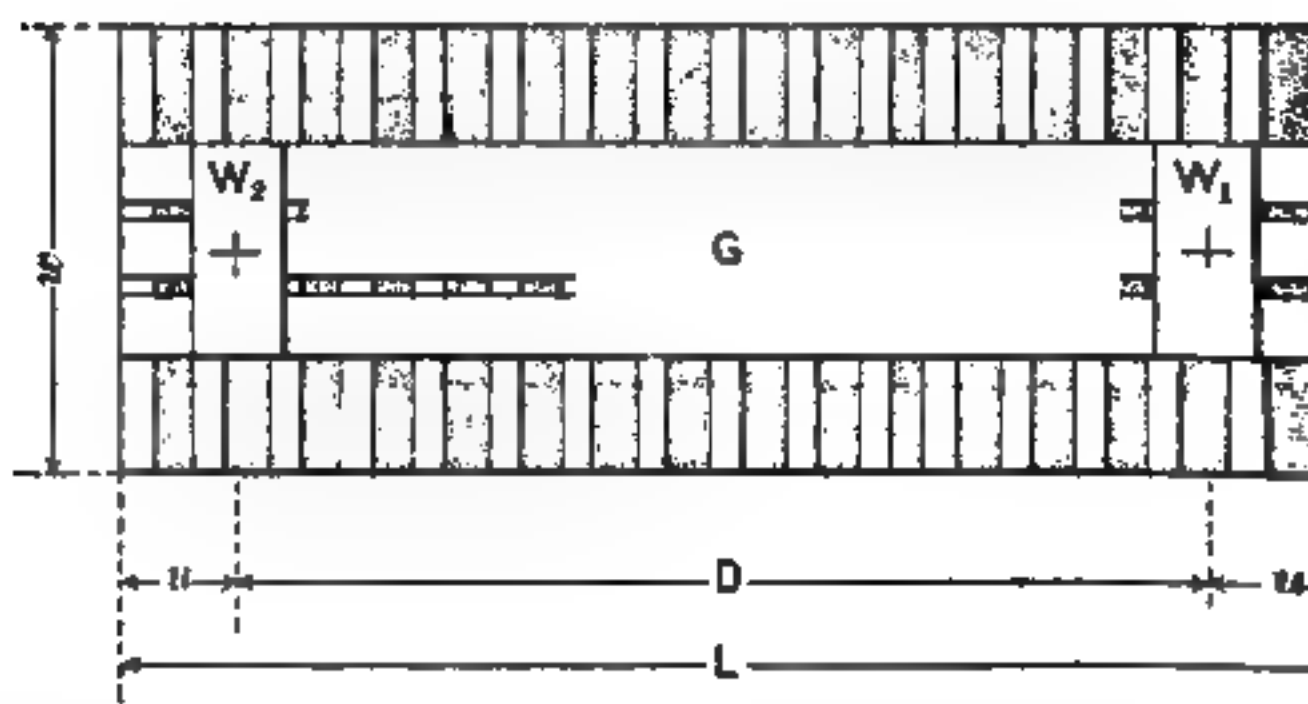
Girdering-method of Foundations. Two Equal Loads
